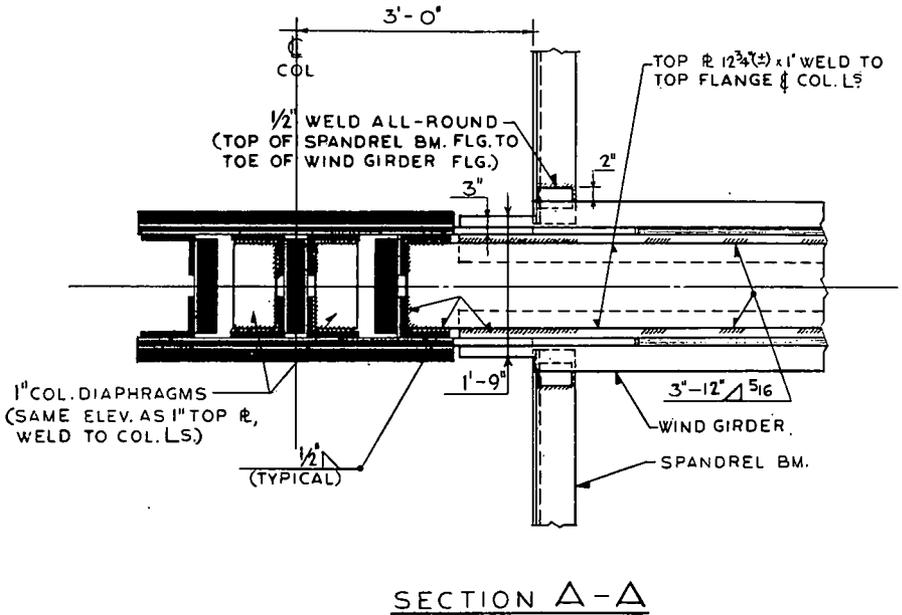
PLAN DETAIL OF GIRDER CONNECTION TO EXTERIOR COLUMN.
